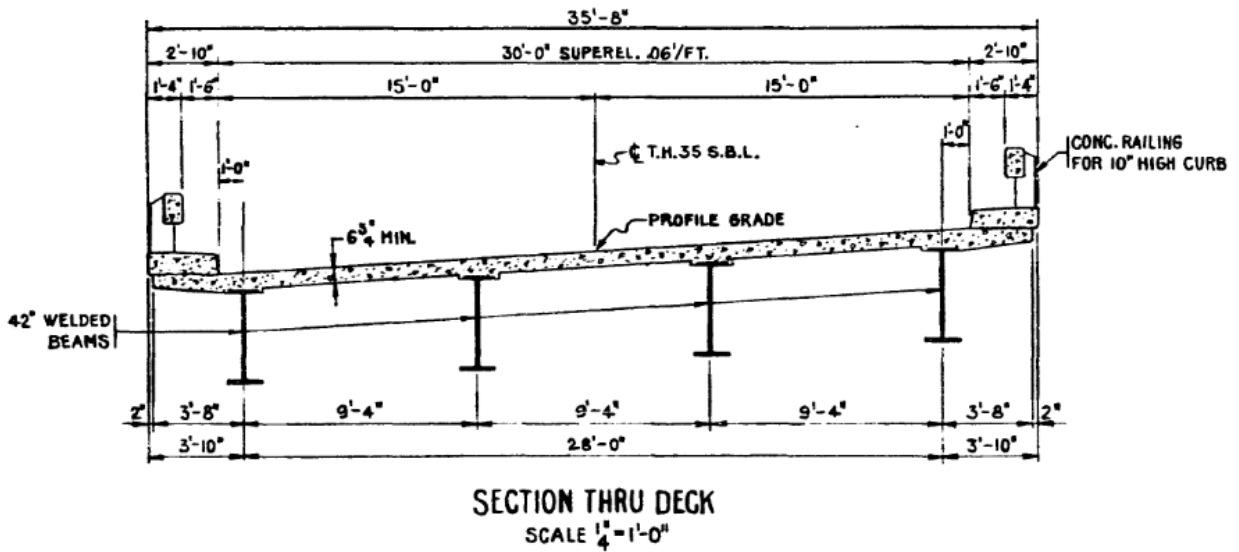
1965 deck cross section with 6 3/4" slab thickness.
